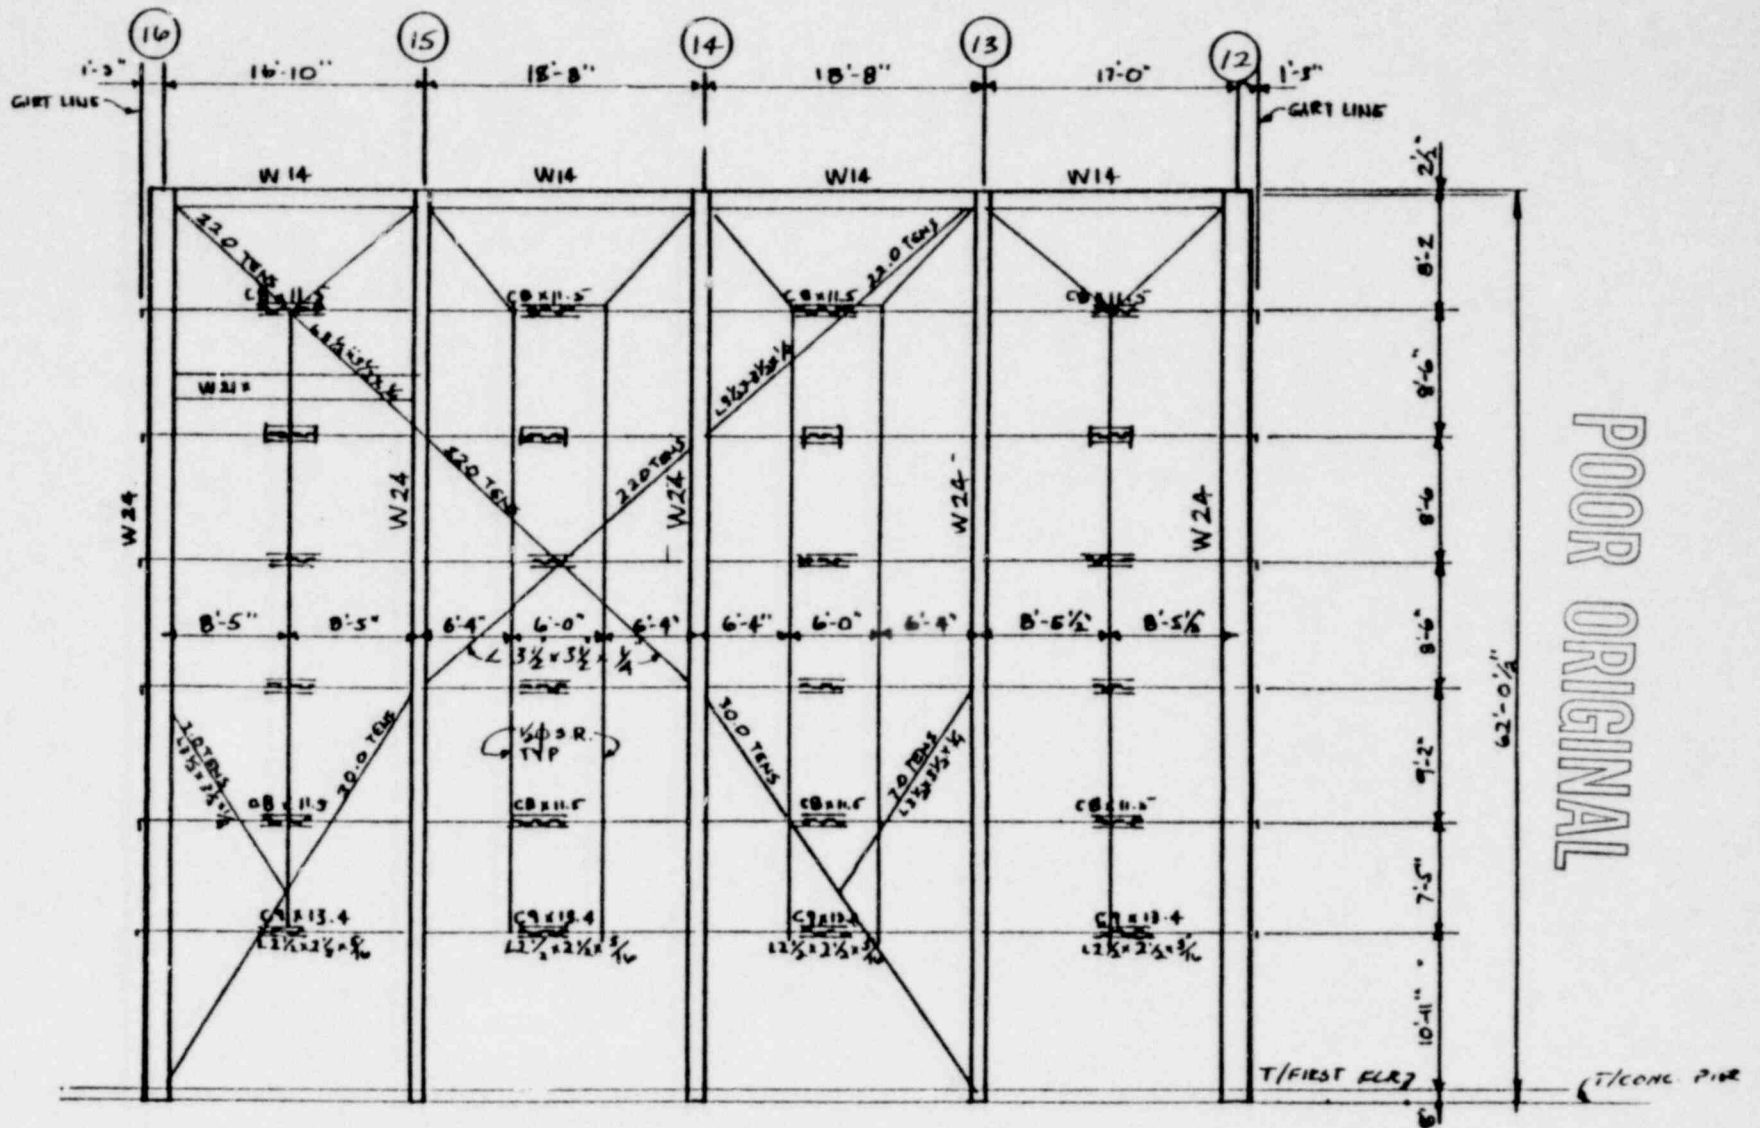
JN-1B WEST WALL FRAMING ELEVATION
